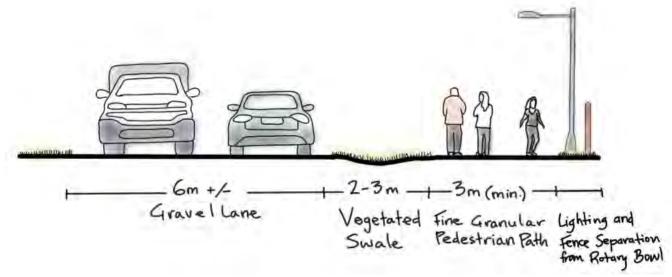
Secondary Road (Tsolum Way) – Proposed Cross Section (typical)
